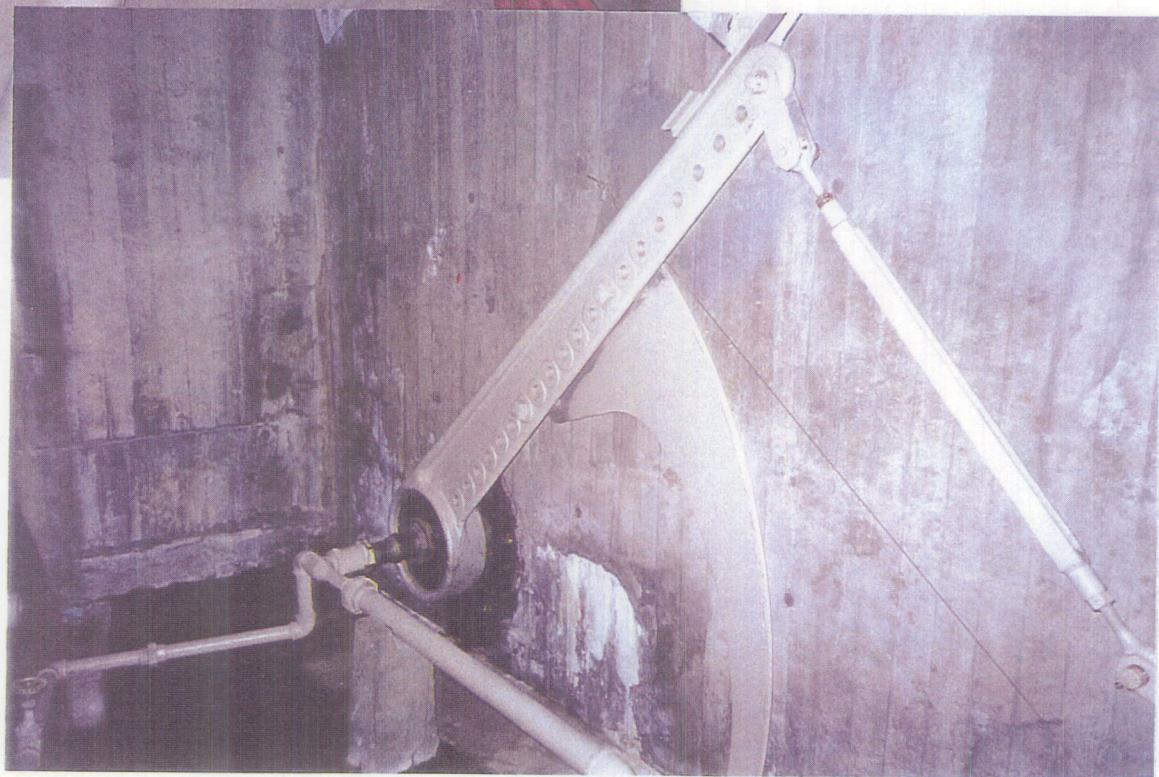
Morris Dam - Drum Gates - View of drum gate position indicator.
